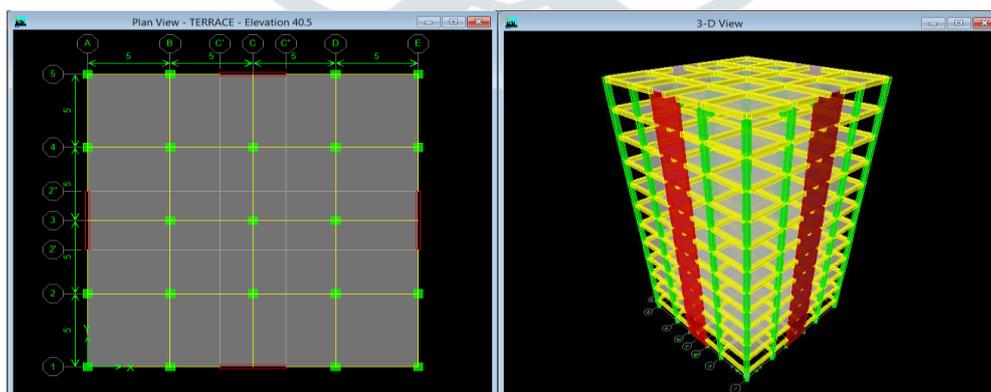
Plan and 3D view of building for R=2 (20m x 20m)
